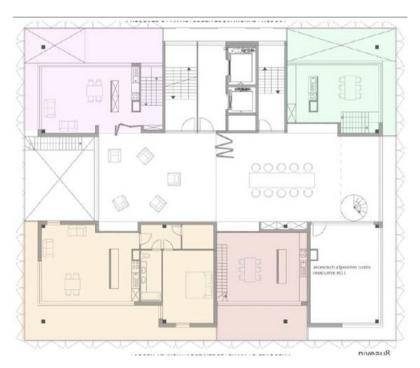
One of the floor plans of the towers as made by the students in design session 3
